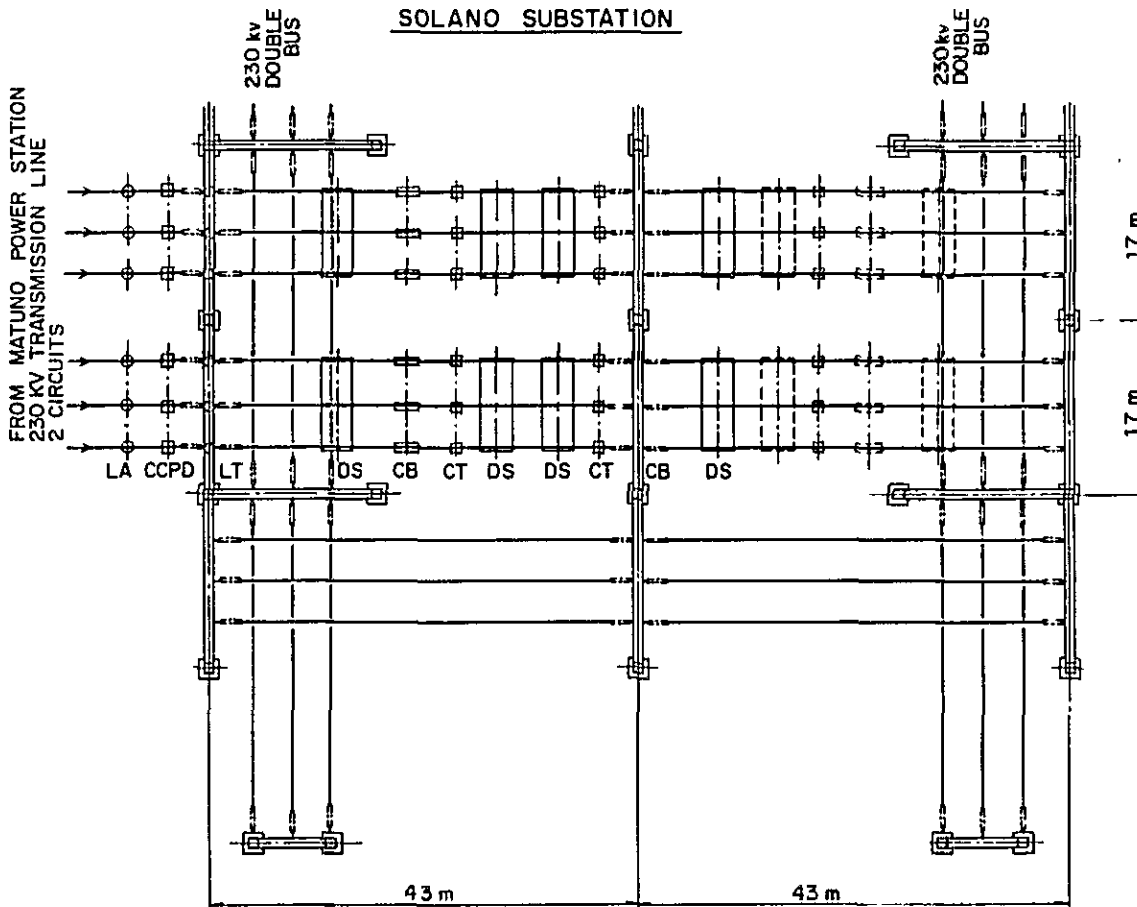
ARRANGEMENT OF OUTDOOR SWITCHYARD
